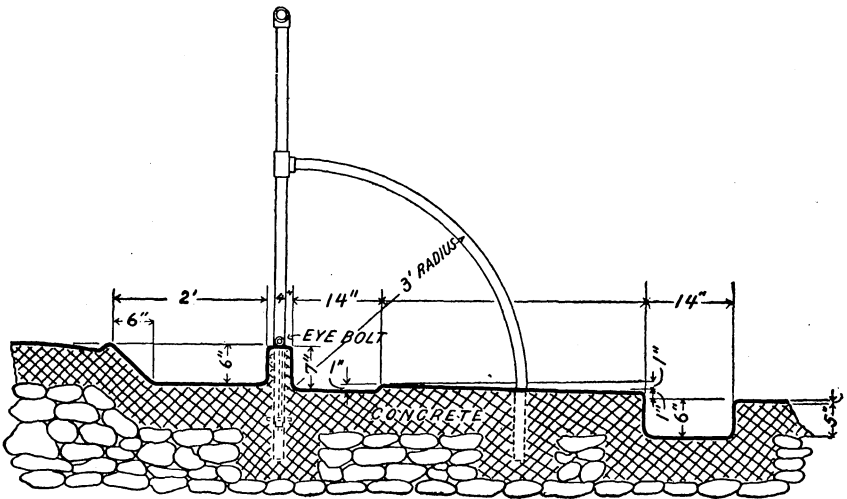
Sanitary stall construction with iron-pipe fittings and chain-hanging stanchions.
